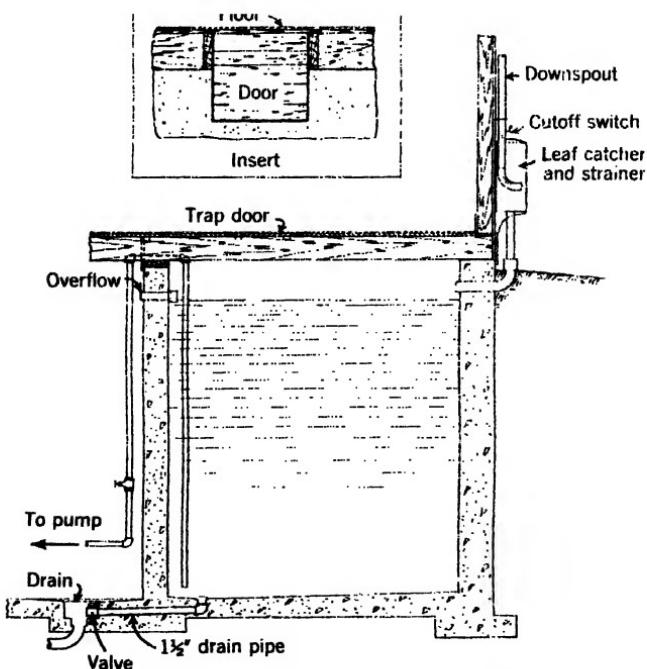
A cistern suitable for a basement. The foundation wall serves as one or more sides of the cistern, the other walls being constructed of concrete. Note that the cistern is entirely enclosed to keep out dust and rodents and that a leaf catcher and strainer is provided on the down spout. Entrance to the cistern for cleaning and repairs may be through a trap door, as shown, or through a special door in the side between two floor sills as shown in the insert.
